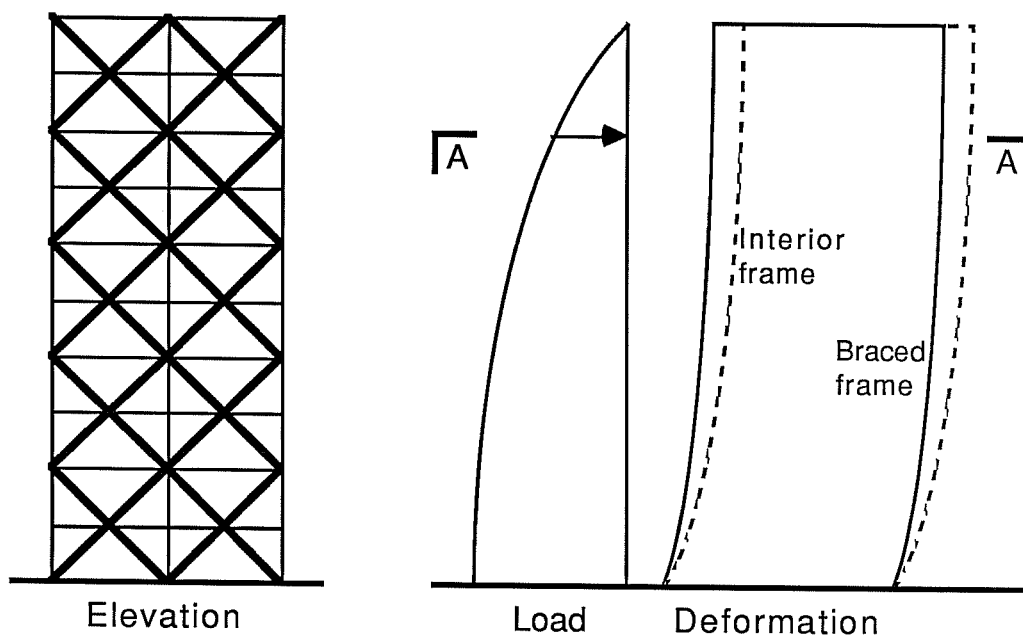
Deformation of a laterally loaded building with stiff perimeter braced frames
